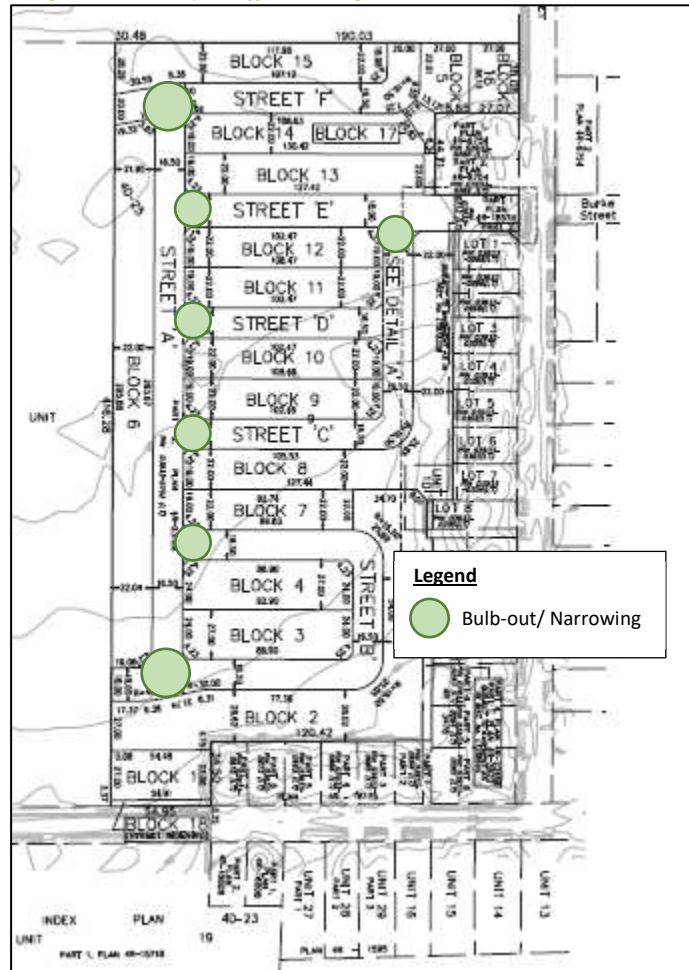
Concept Traffic Calming Plan – 6305 Ottawa Street West
